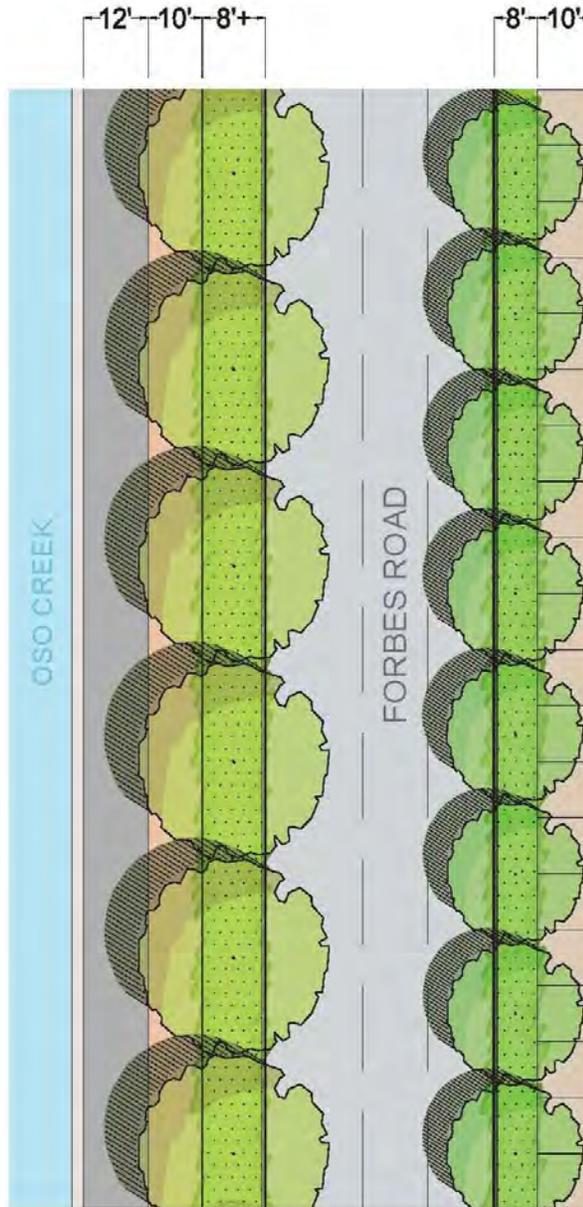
B Forbes Road, North of Crown Valley Parkway: Cross Sections—Looking North
